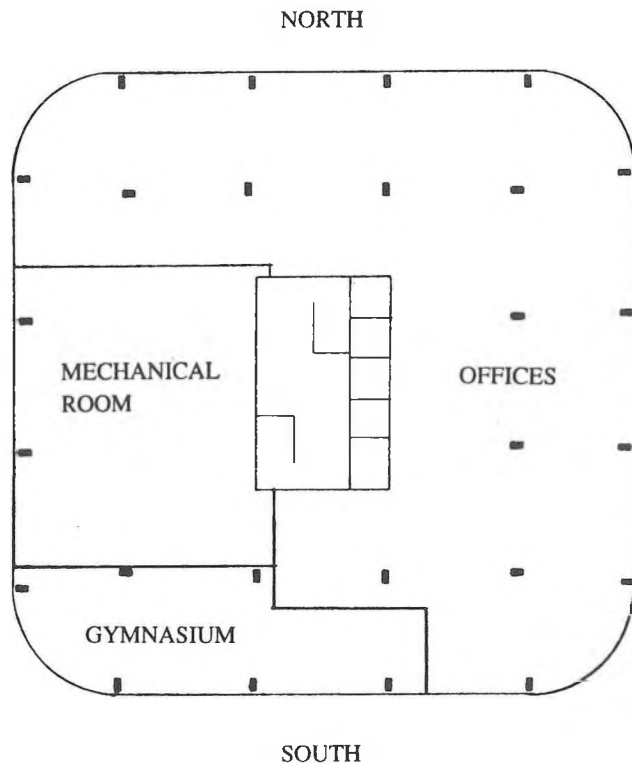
Layout of Structural Elements and Rooms on 26th Storey of Concrete Office Building
